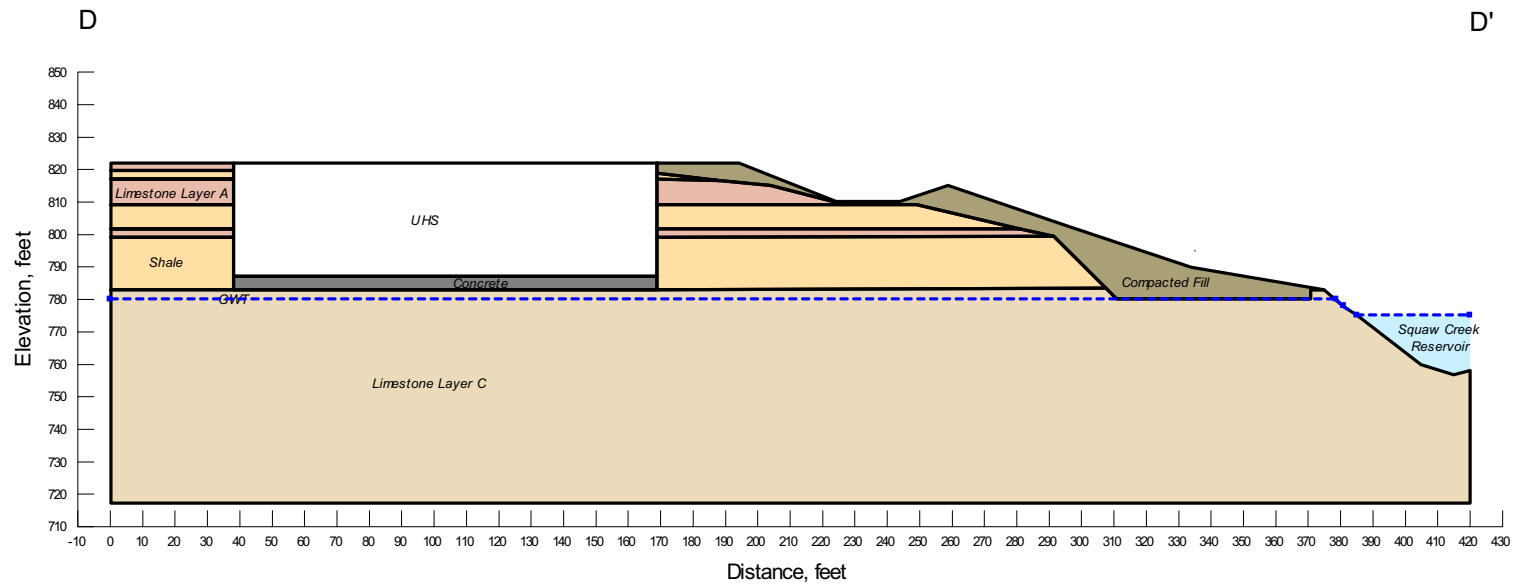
Post-Construction Cross Section D-D'
